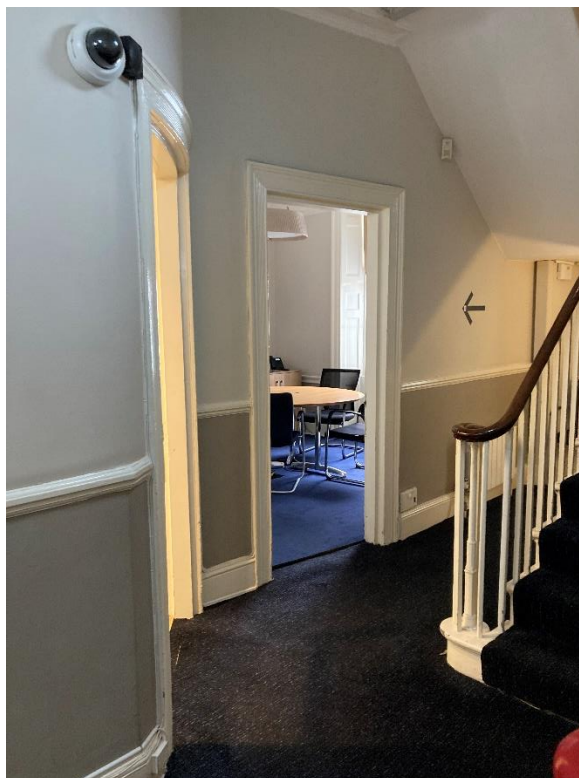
Existing internal circulation space and access to meeting room and office on ground floor of No.10-11 Doughty Street accessible in a wheelchair
